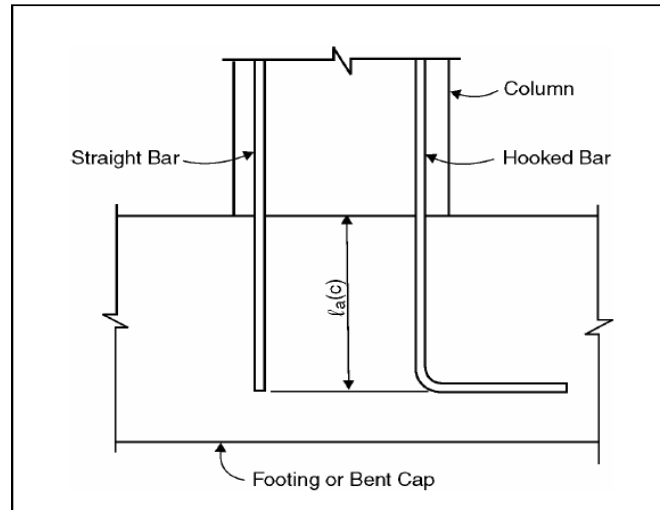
18. Anchorage of longitudinal reinforcement (FHWA, 2006).
